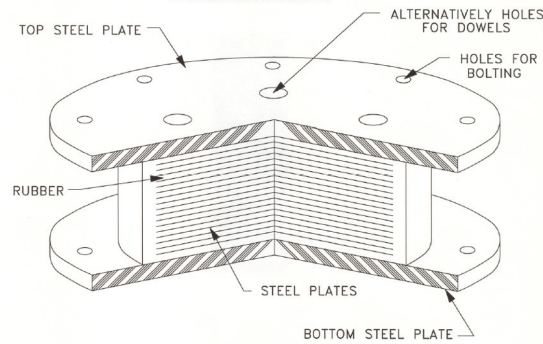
Cross section of an elastomeric bearing (adapted from Constantinou et al. [2006]).
